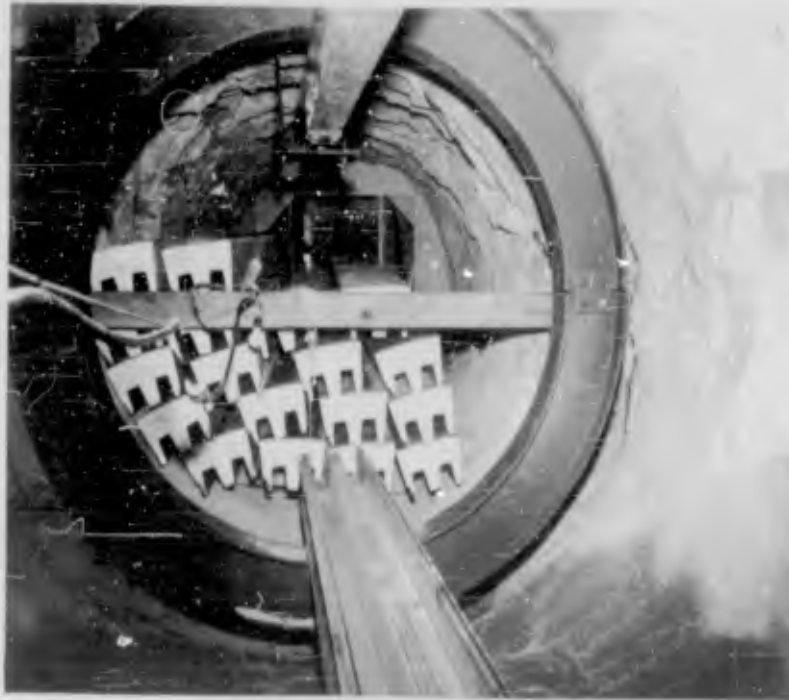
Corrugated steel decking panels with precast foam prior to installation around wide-flange rings (DASA - NOU 038-08 NTS-62).
